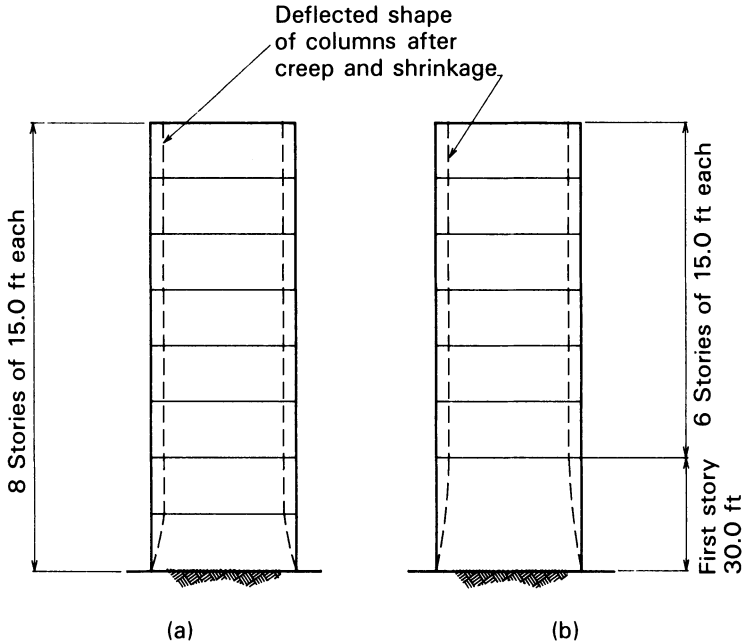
Elevation sections of two multistory buildings having the same heights. (a) Building in which all stories have a height of 15 ft. (b) Building with a first-story height of 30 ft., with the remaining stories having a height of 15 ft.
